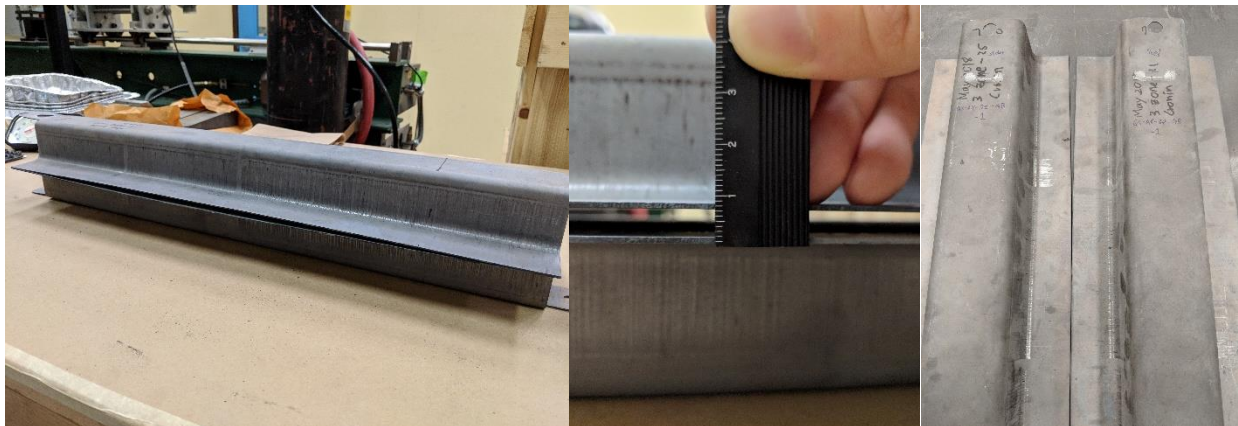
Gap between three zone flanges in a double-hat configuration (left and centre), and gap between three zone flanges when placed side by side (right)
